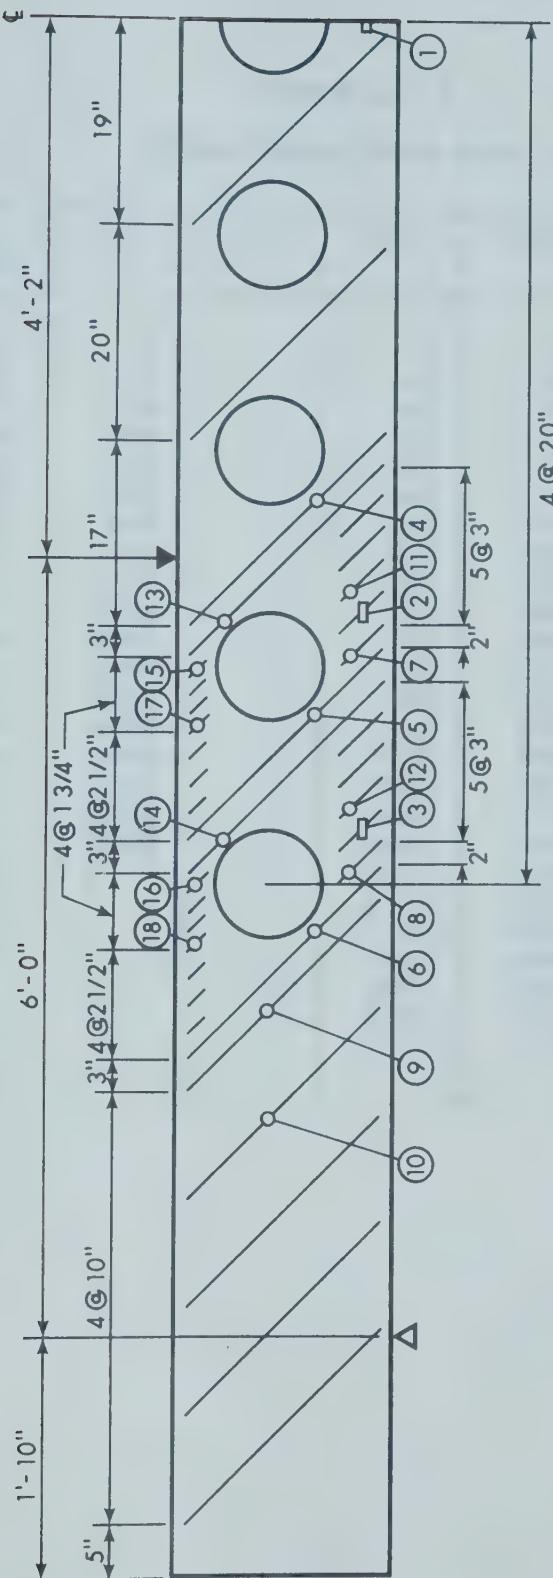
BEAM AD-4 REINFORCEMENT AND GAUGE DETAILS
